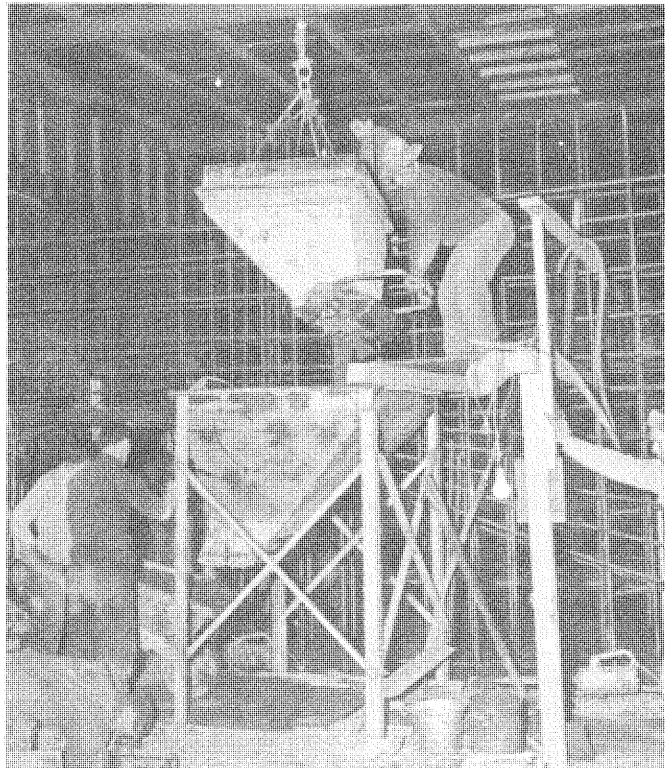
Interior view of temporary protective shelter over area between lines 1 and 3 and lines B and C of the powerhouse. Floor slab and wall are being placed between elevations 24.00 and 27.96. Crane-operated bucket was lowered through opening in the roof. P783-908-1559, March 12, 1954.
